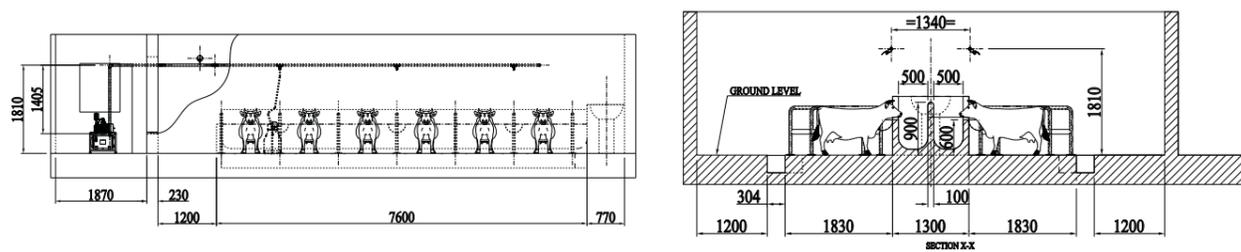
(d) Milking Machine Installation Schematic in cow shed-sectional view
